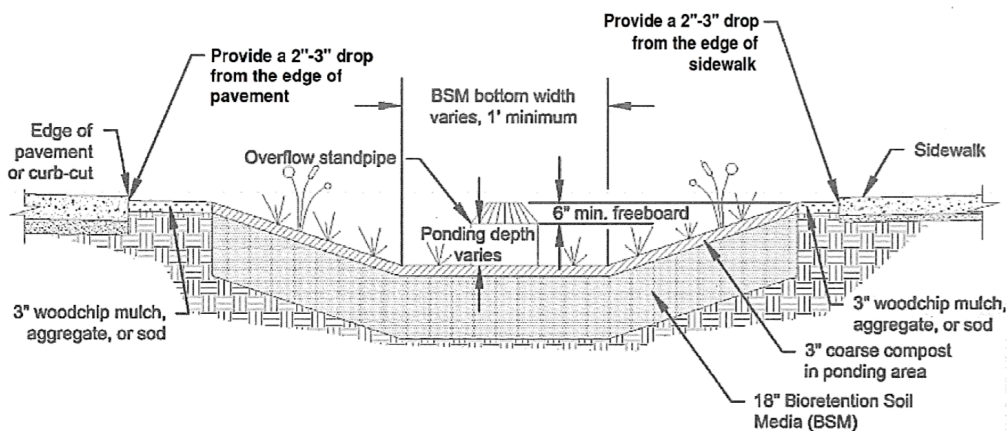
Bioretention System Without Underdrain (Cross Section)
